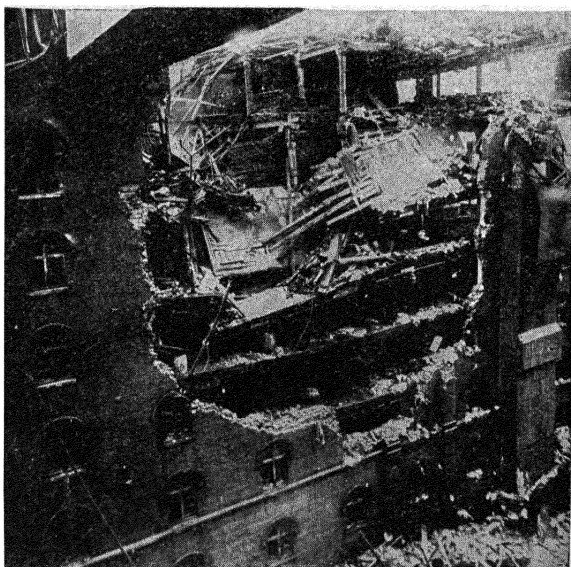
Sugar dust caused this explosion. Twelve men lost their lives.
